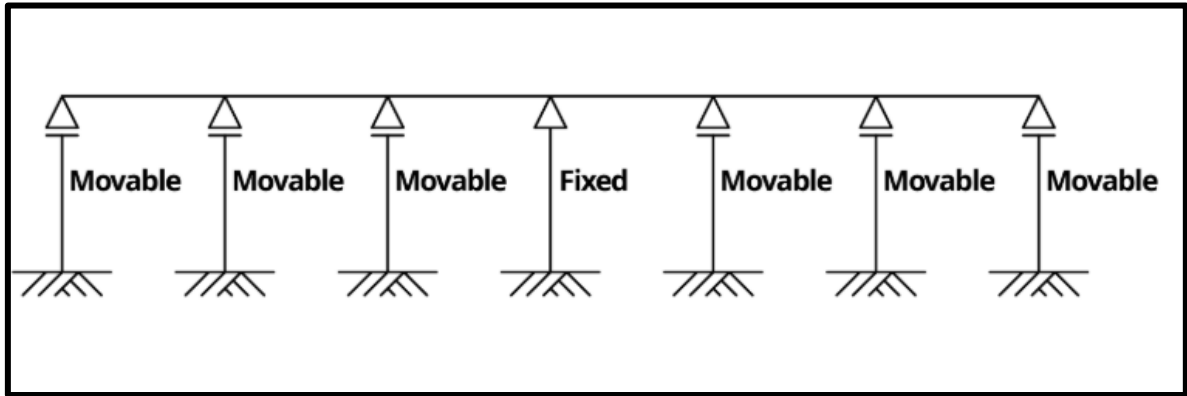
Conceptual diagram of single fixed supported balanced cantilever bridge
